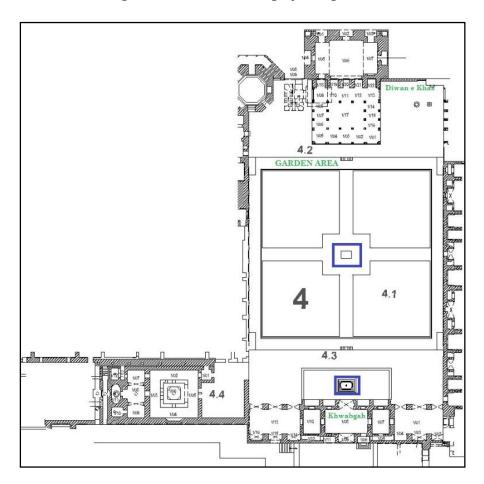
Plan of Shah Jahan's quadrangle- focusing on garden area and fountains
